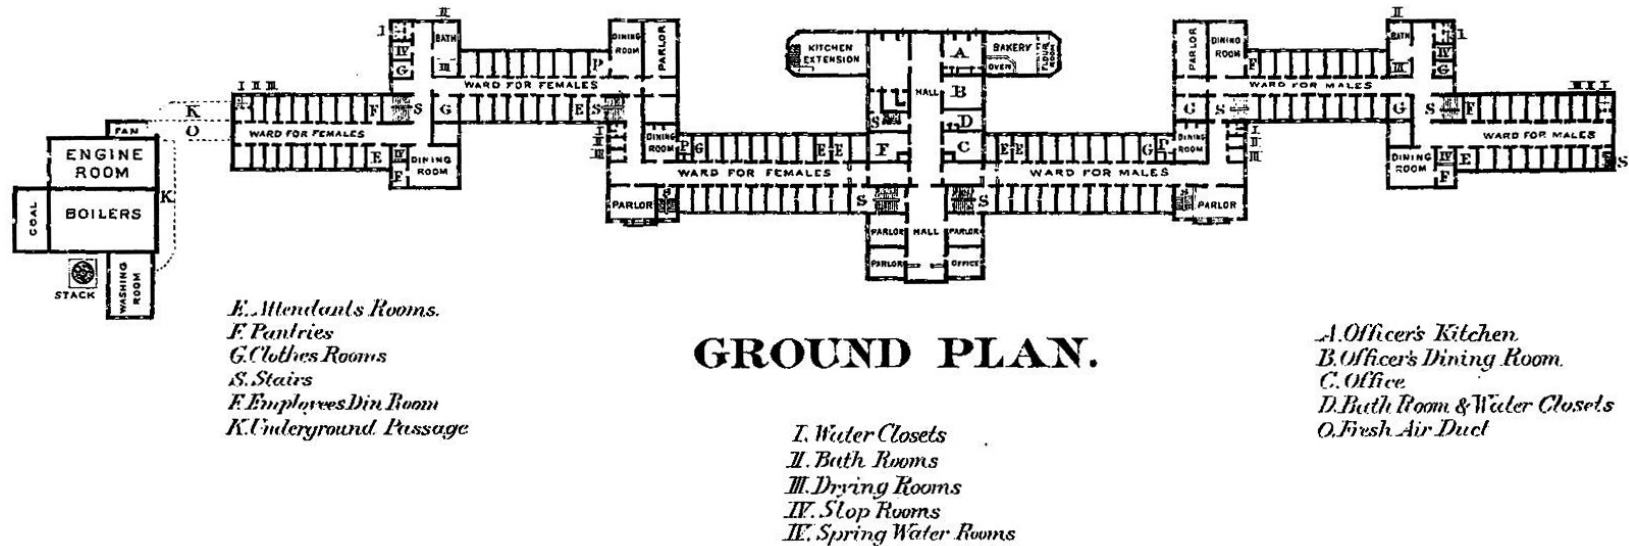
An example of the Kirkbride plan. Source: kirbridebuildings.com.
